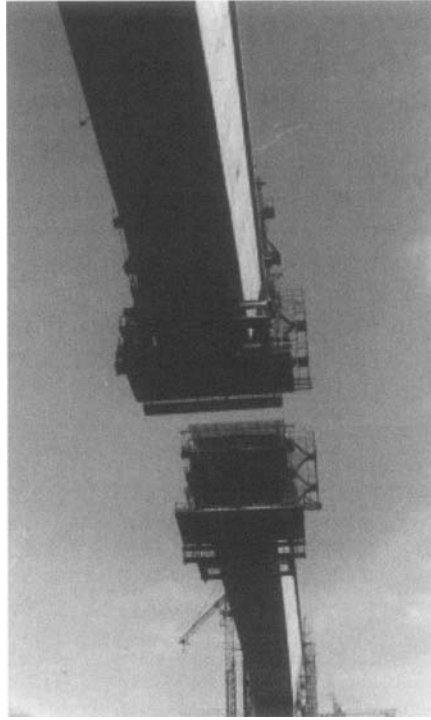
Cantilever construction needs accurate control of shrinkage and creep, S. João Bridge, Porto, Portugal
